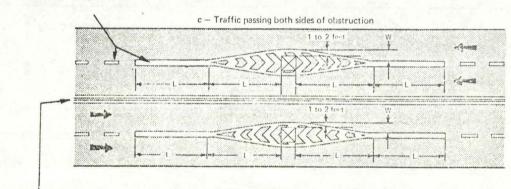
Standard Pavement Markings Approach Markings for Obstructions in the Roadway
